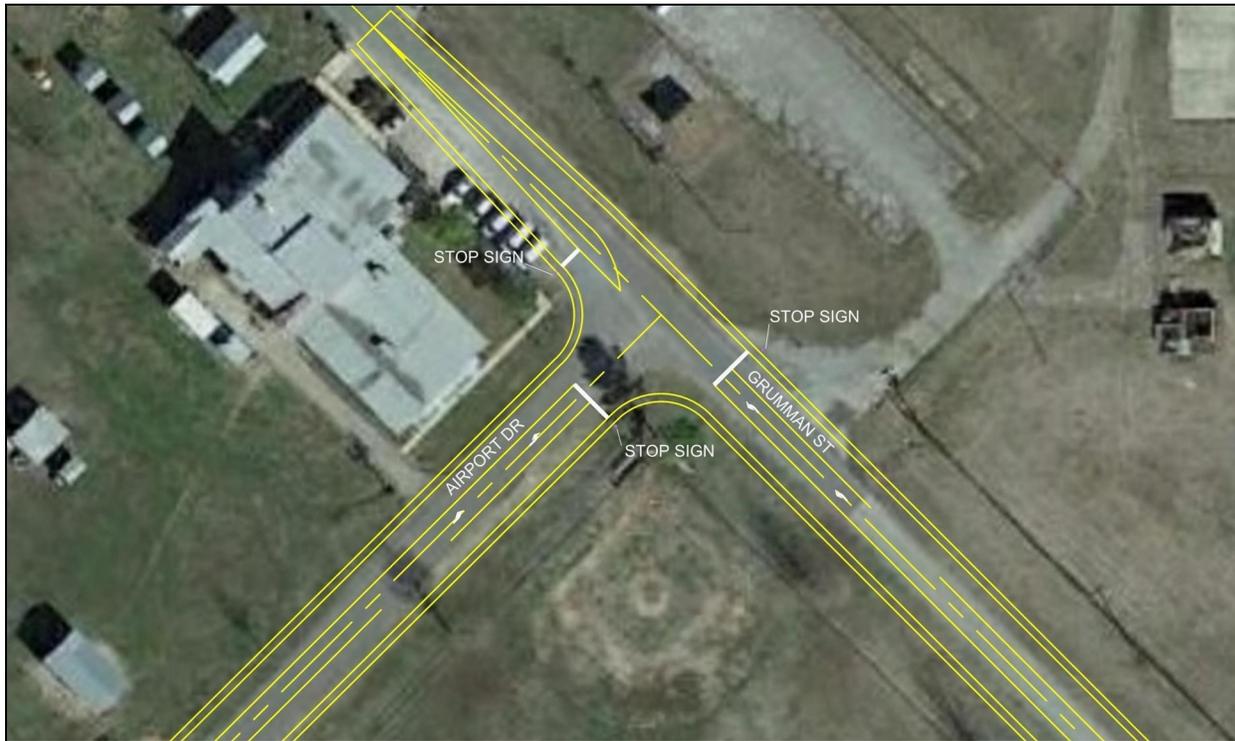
Grumman Street/Airport Access Road Proposed Intersection
